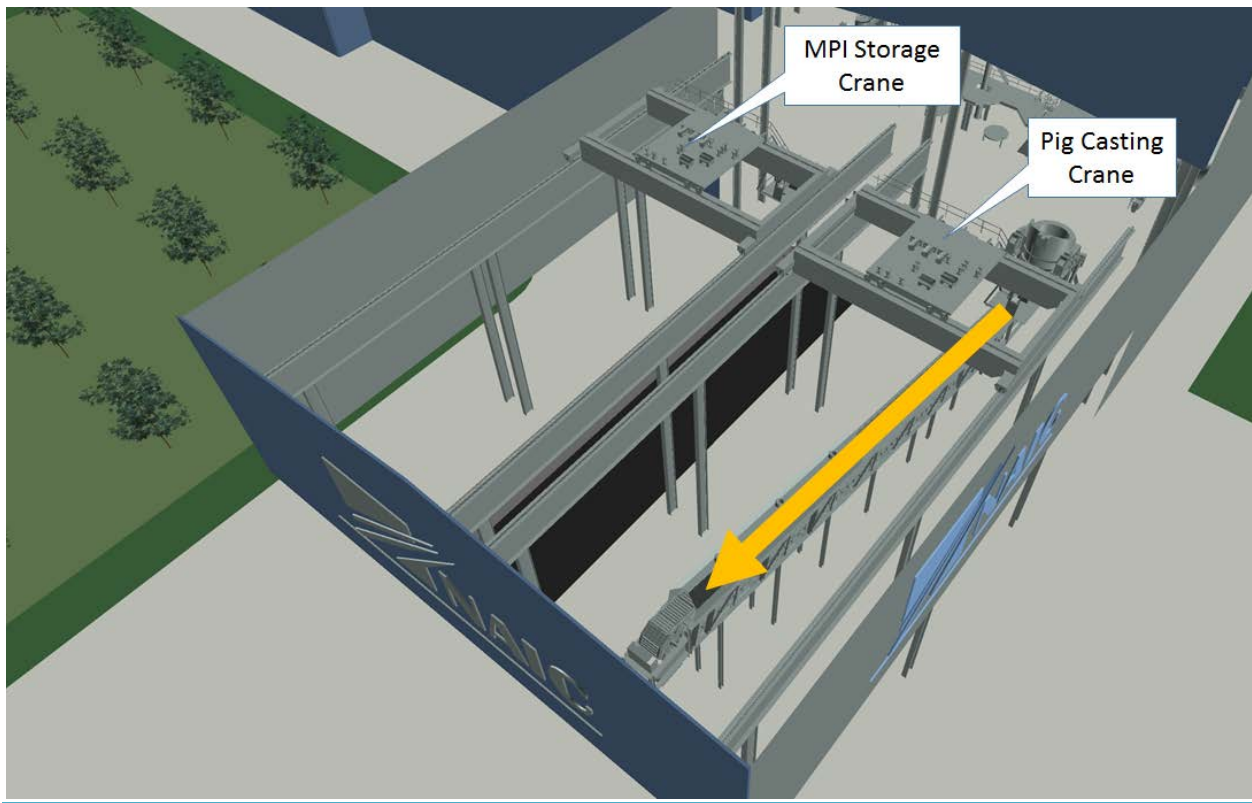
3D view of the Pig Casting bay and adjacent MPI storage building
